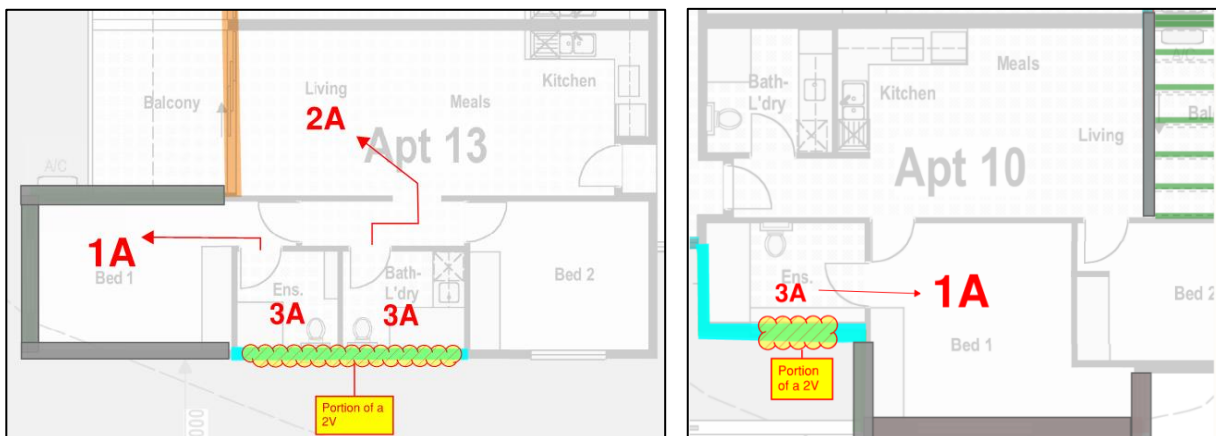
The rooms that these 3A's are adjoined to become type A's as they now have a greater risk of being impacted by fire
